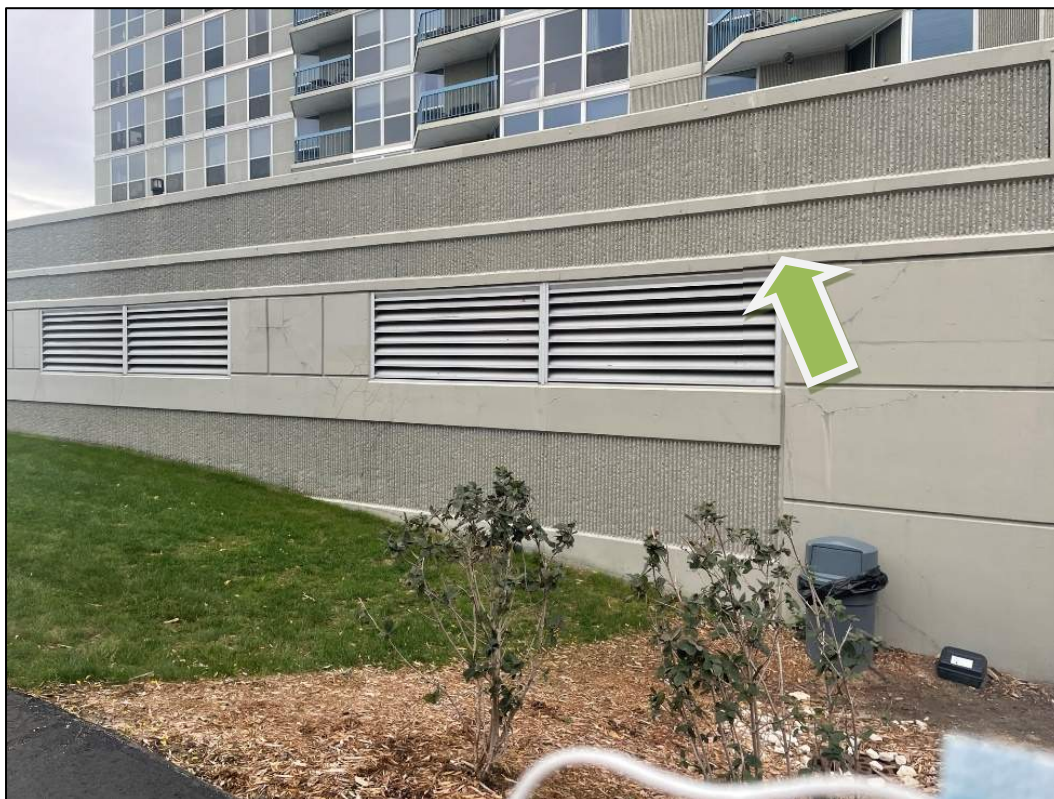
Below the cold joint, there are concrete cracks that will lead to imminent spalls and should be injected.
